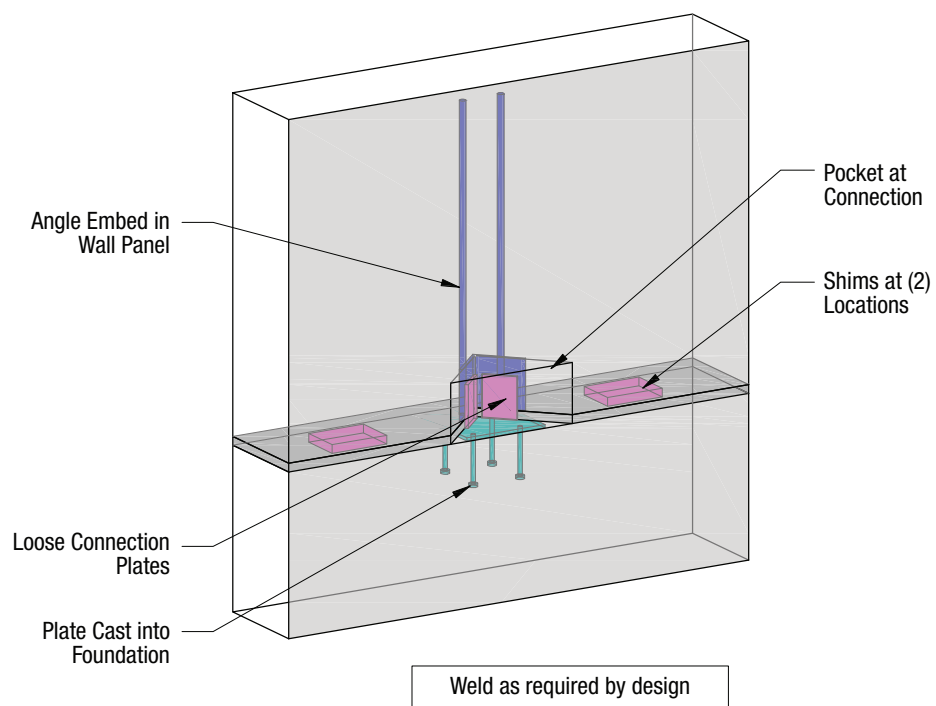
Angle-pocket welded connection for horizontal wall-wall joint.
